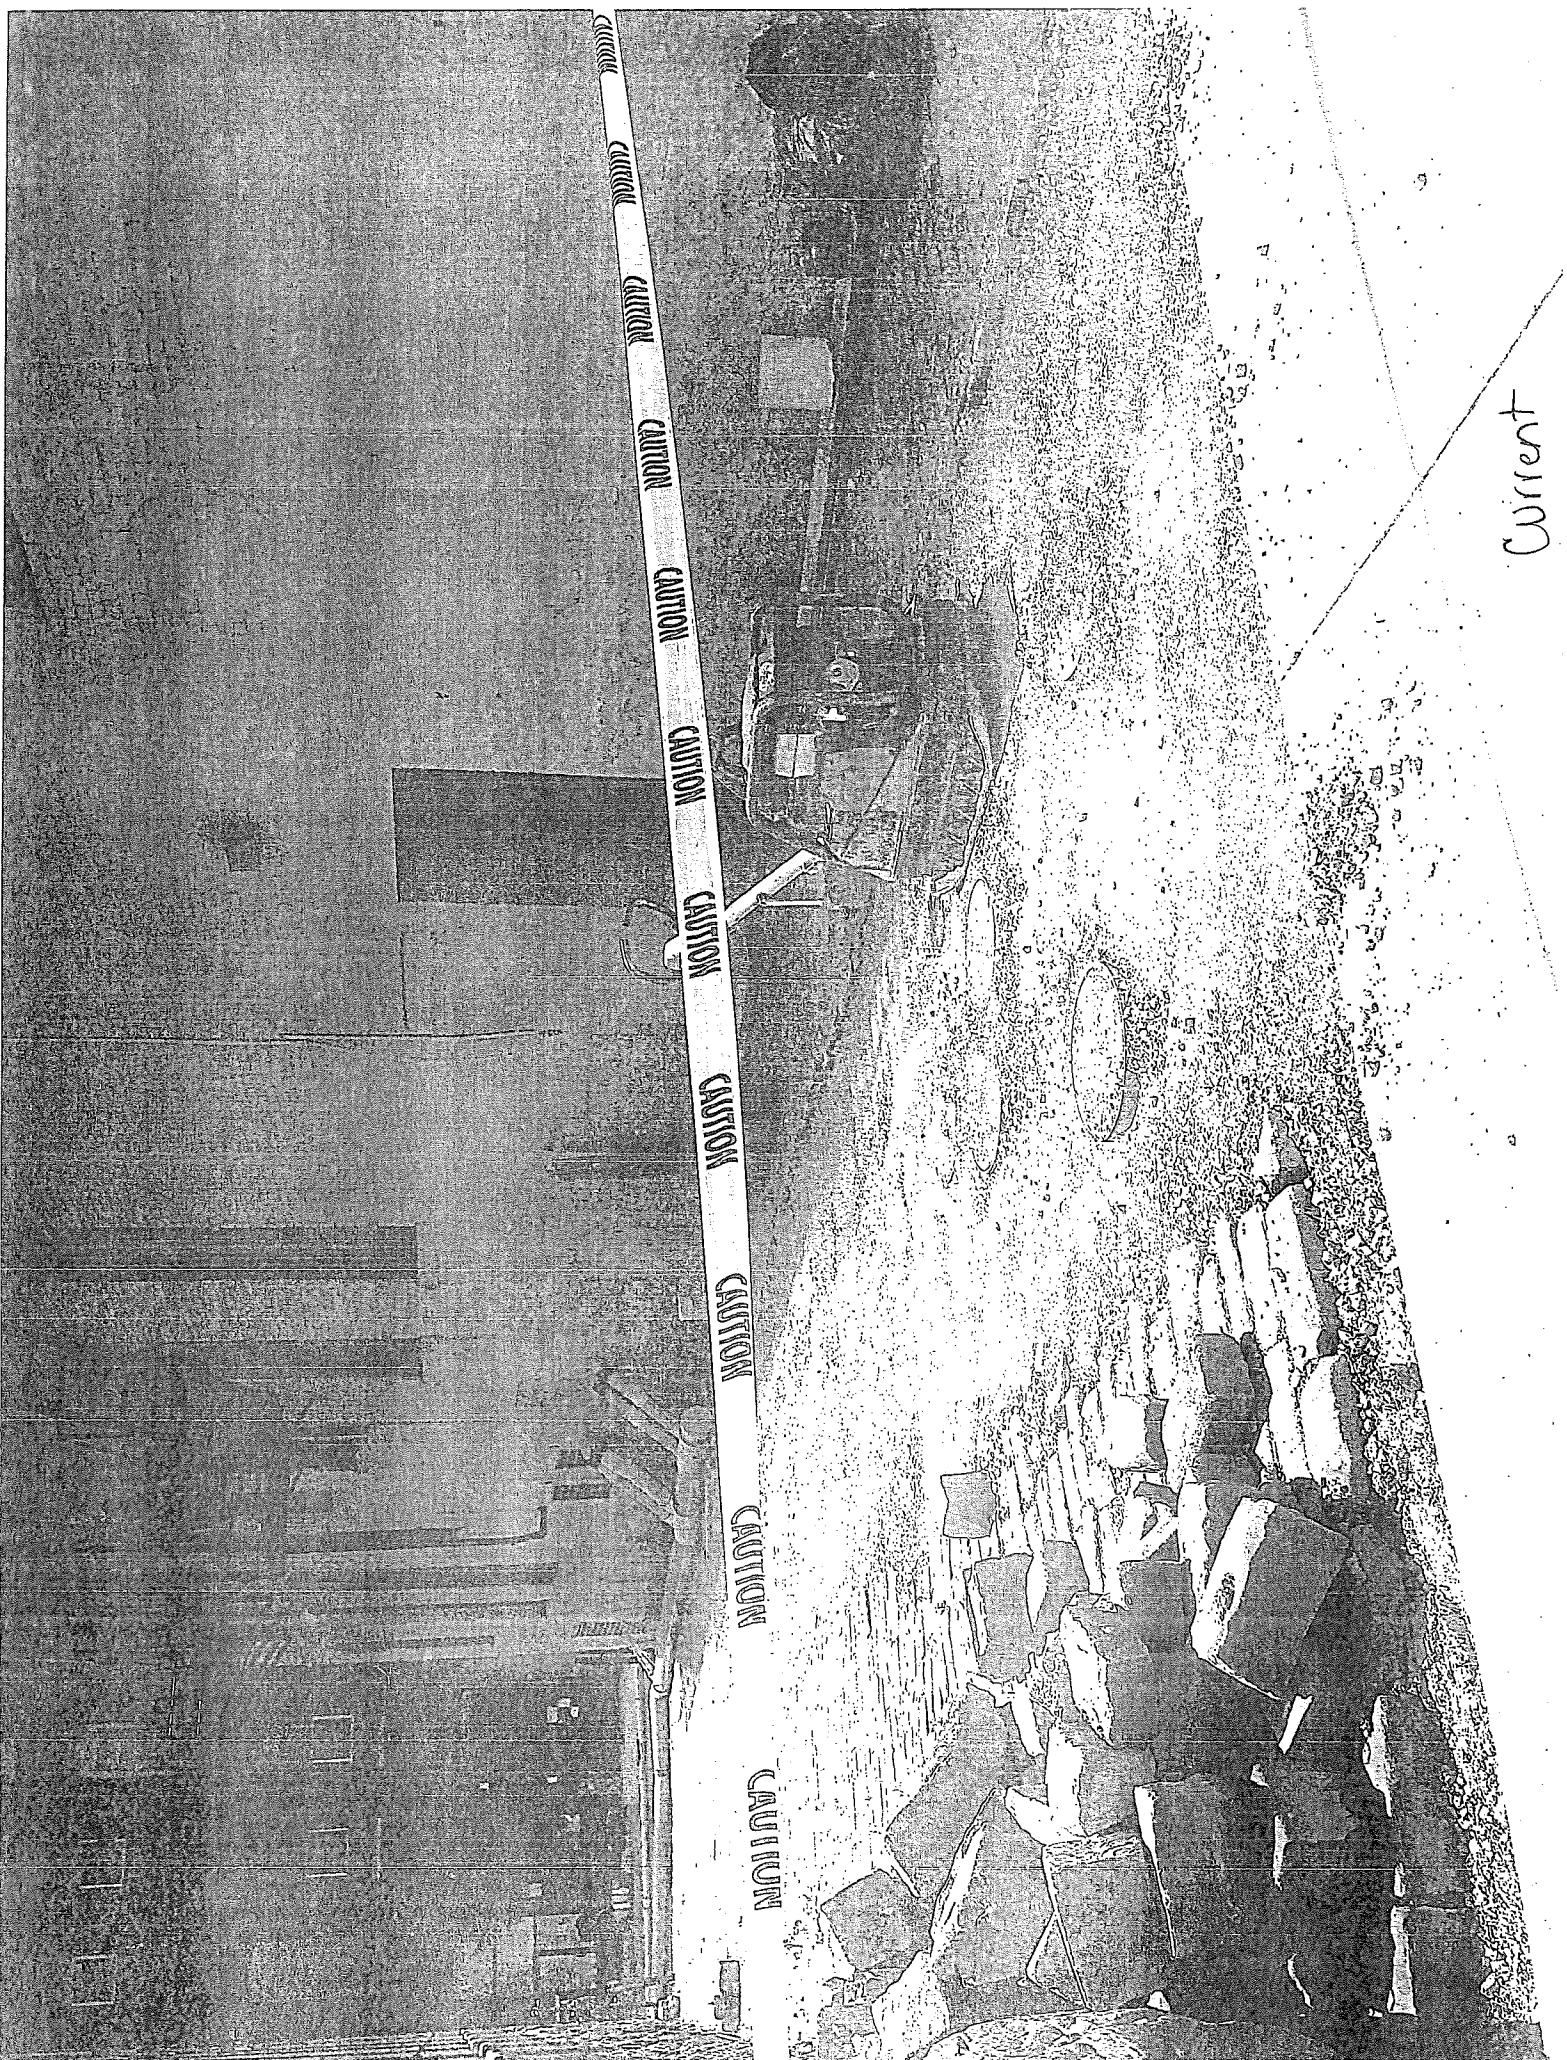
North end of public alley looking south, showing removal of concrete surface over gas pipeline trench.
